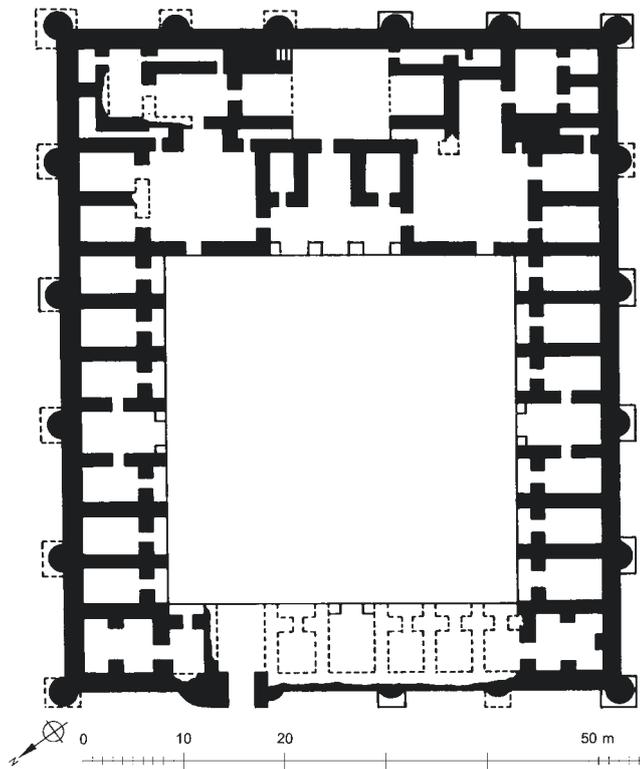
Tulūl al-Shu'ayba, residence, ground plan. – (After Creswell/Allan, Short fig. 134. New scale).
